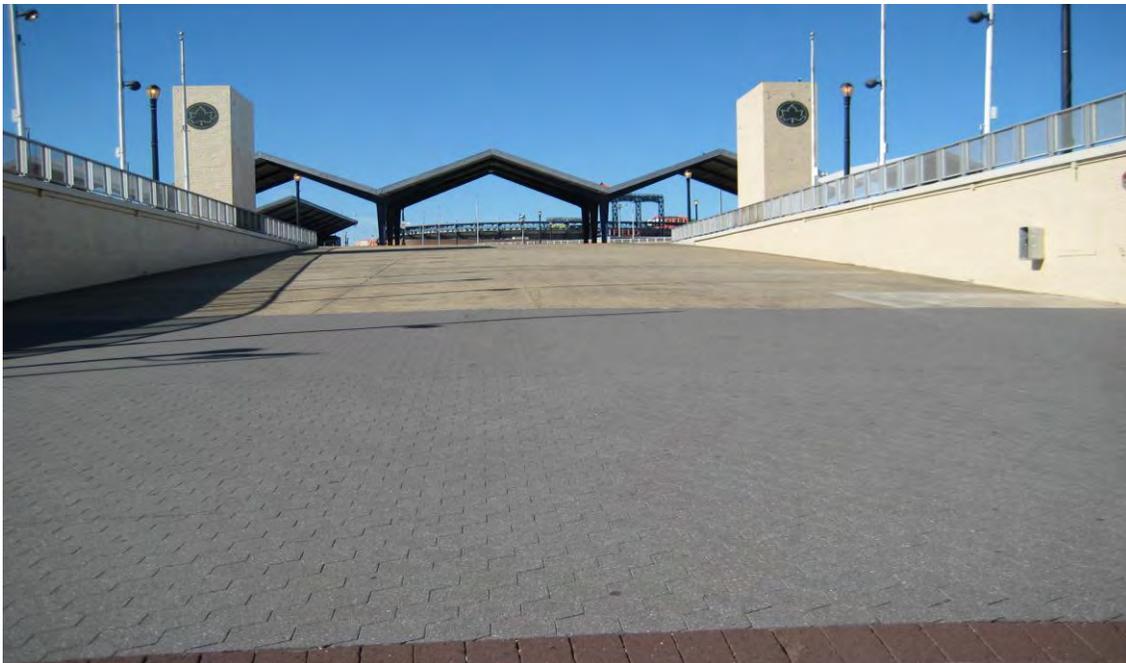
Roof/Sitting area over the East wing of Passerelle Building
